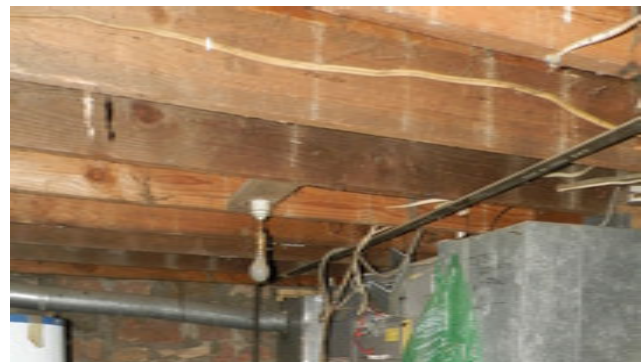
View of main floor framing from basement, 2020 (source: Ratio)
